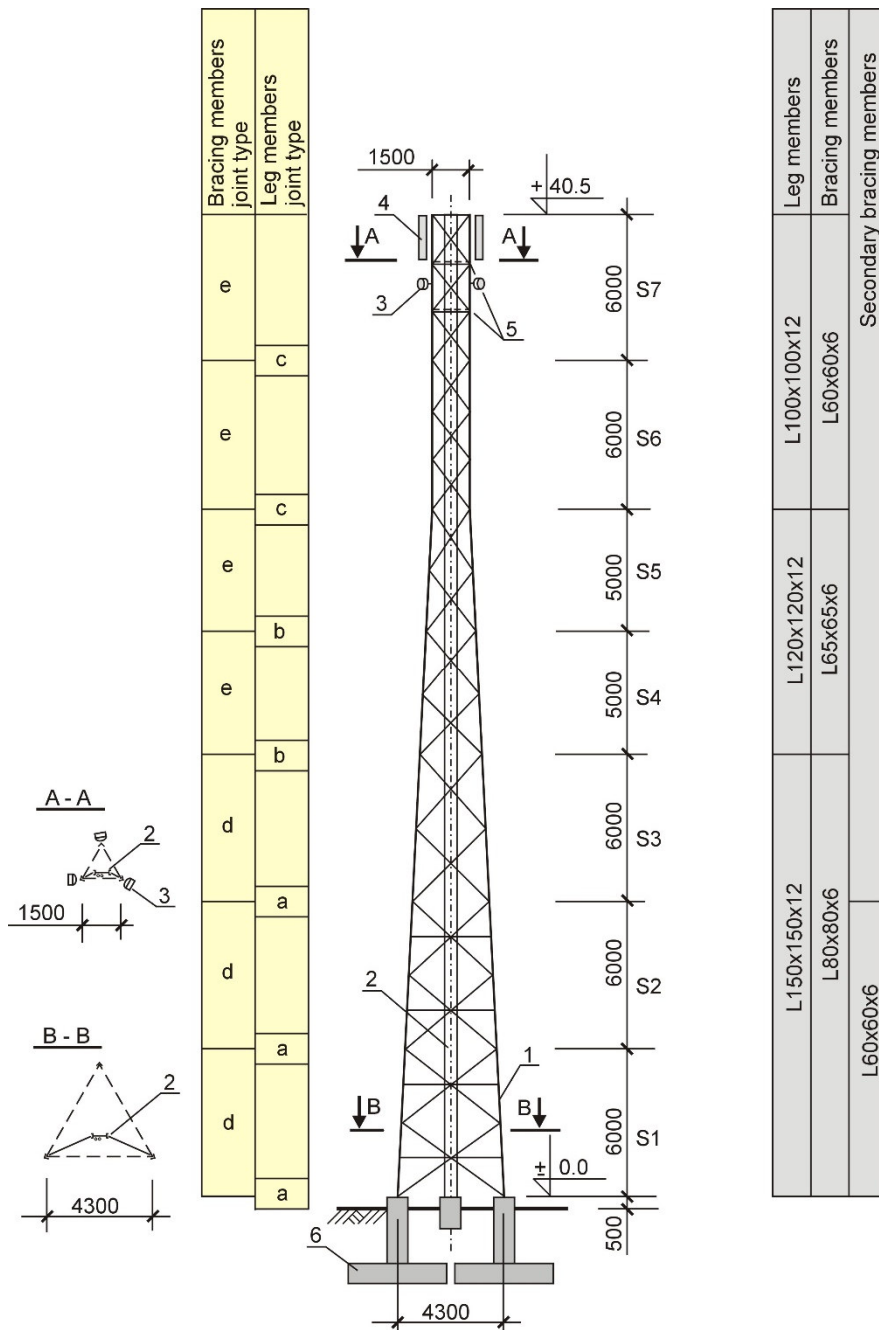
The steel lattice tower analysed: 1 - tower shaft, 2 - ladder with cables and feeders, 3 - microwave antennas, 4 – panel antennas, 5 - working platforms, 6 - foundations
